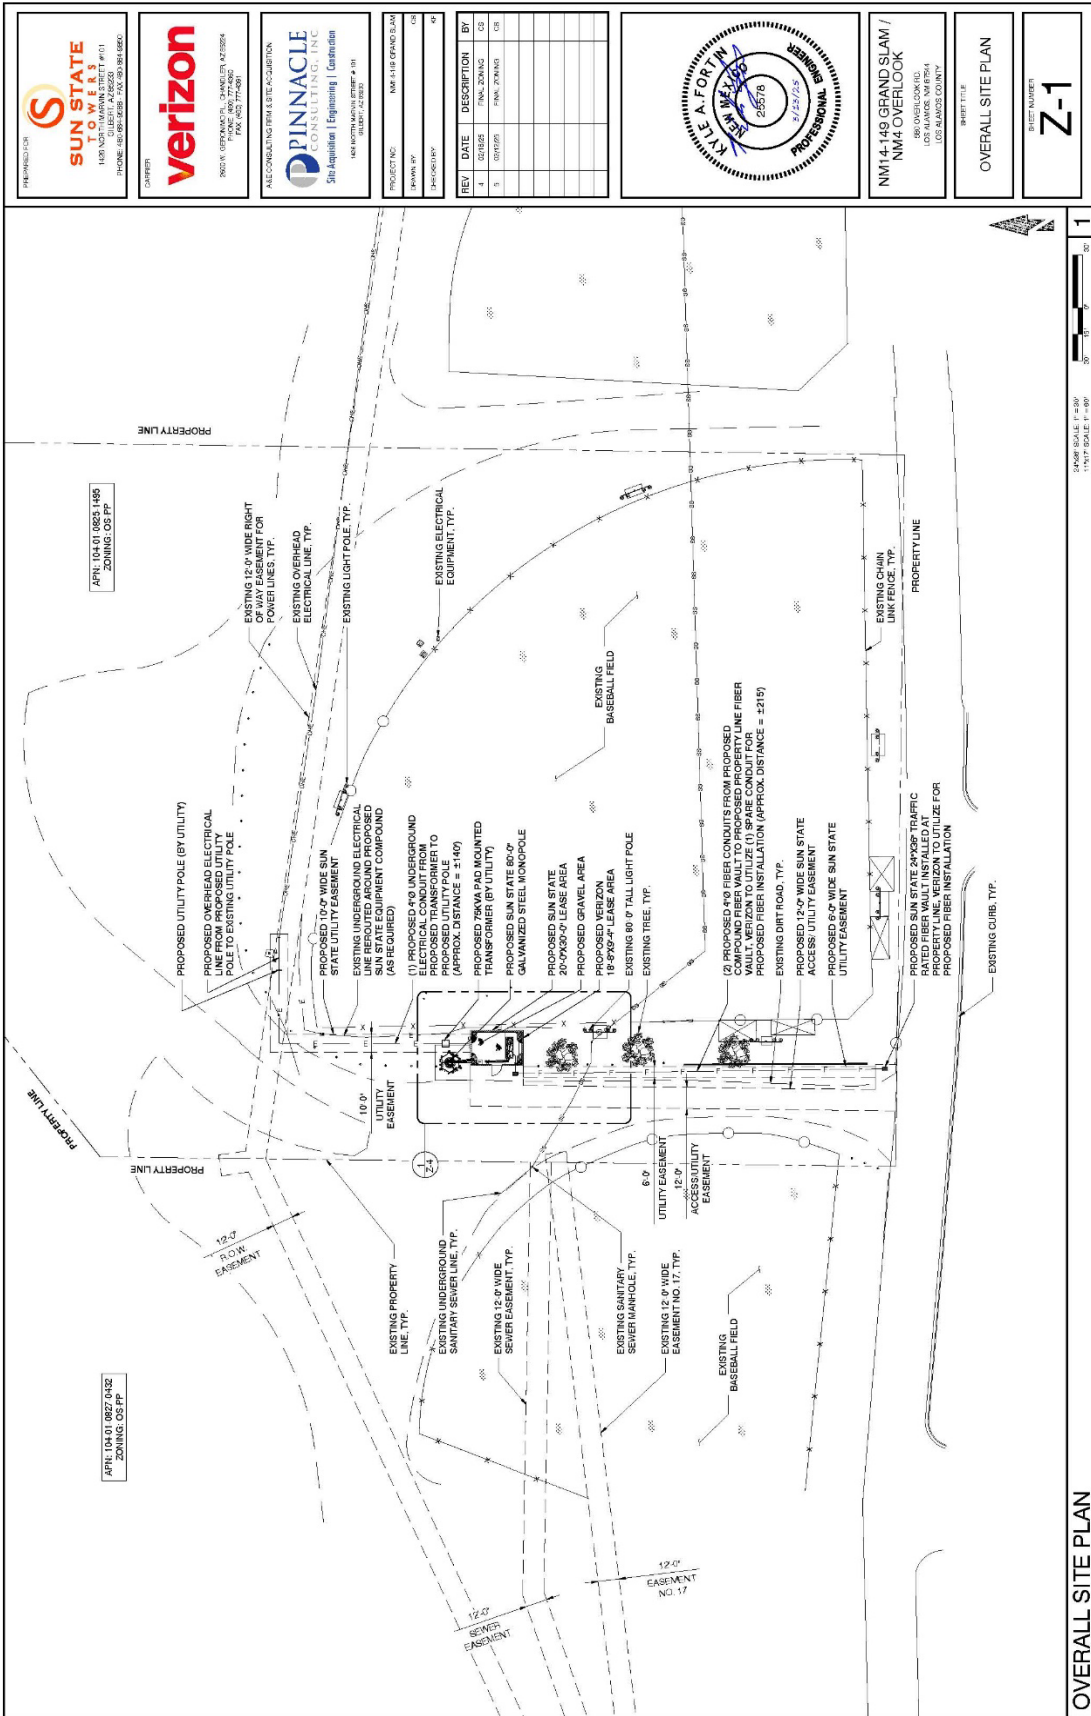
Plan Set page Z-1 – Overall Site Plan, showing the location north of Overlook Road, adjacent to a ballfield.
